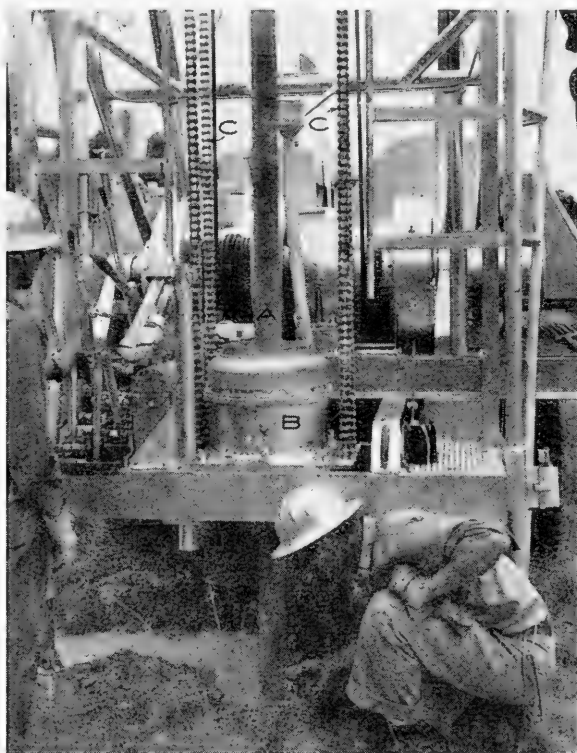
Mud pump of mechanical feed type drill, (A) drive rod or Kelly; (B) rotary table; (C) feed chains.
